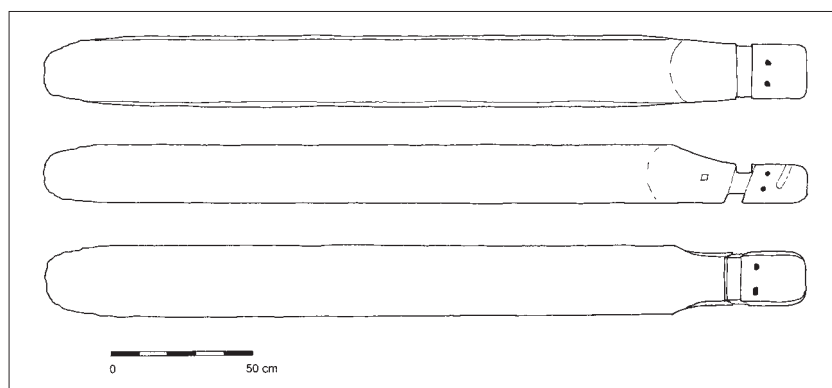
Through-beam found loose on the site (Drawing: M. Flecker).
